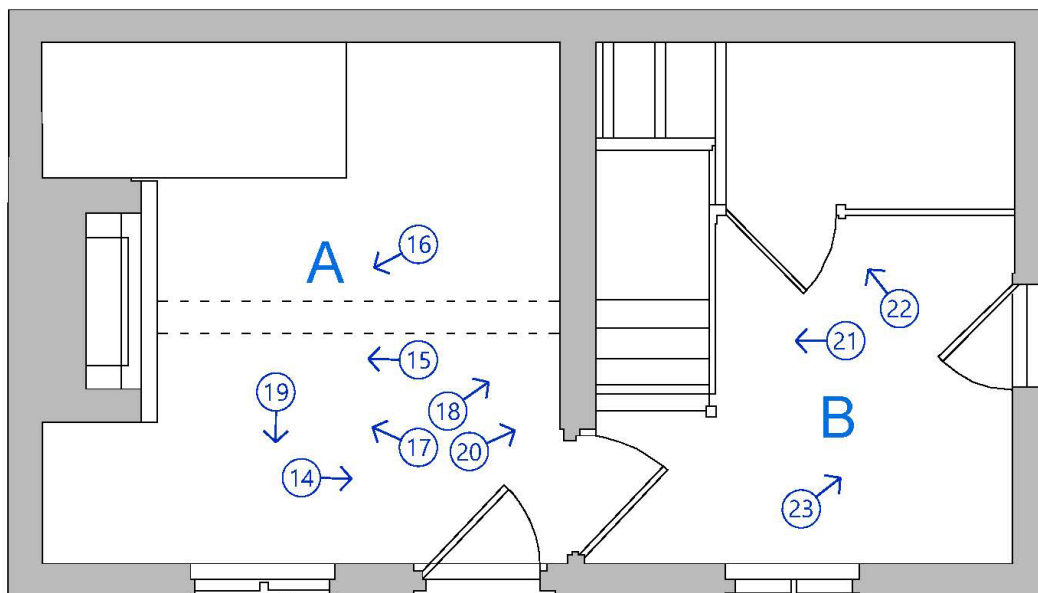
Plan of the ground floor of Ford Cottage, with photo directions
